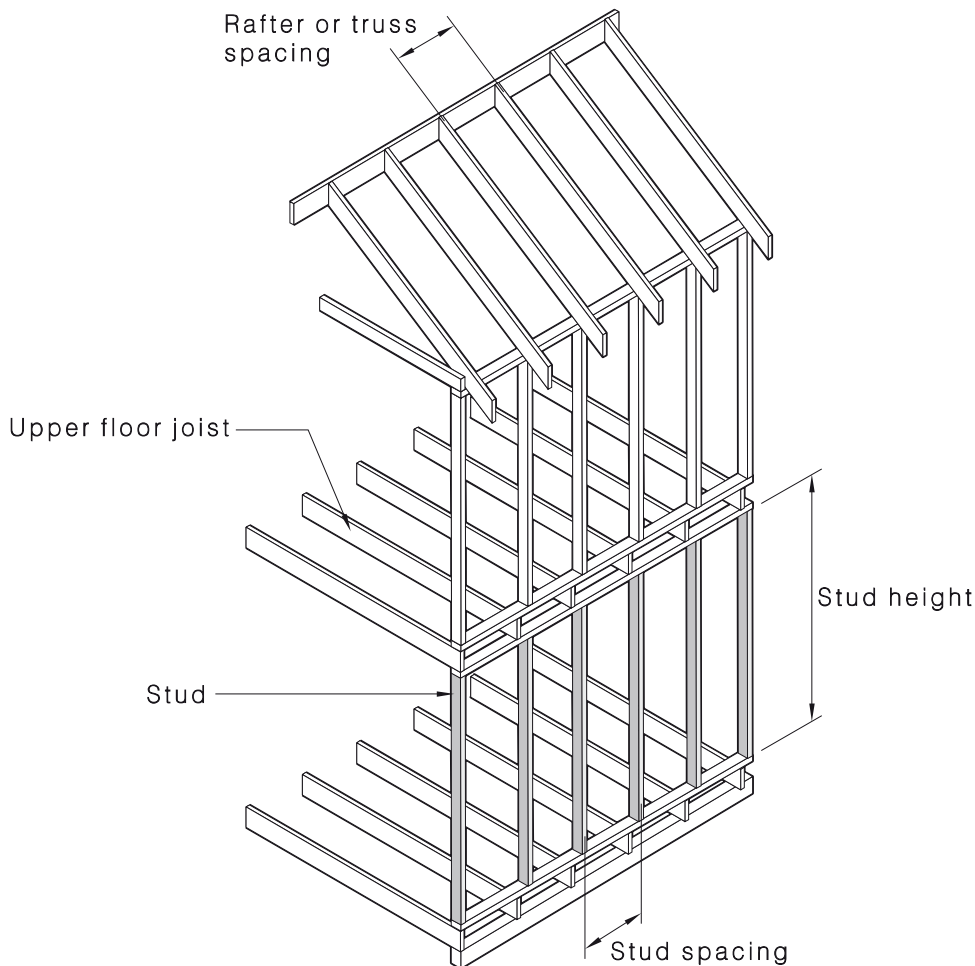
COMMON STUDS—LOWER STOREY OF TWO-STOREY CONSTRUCTION
